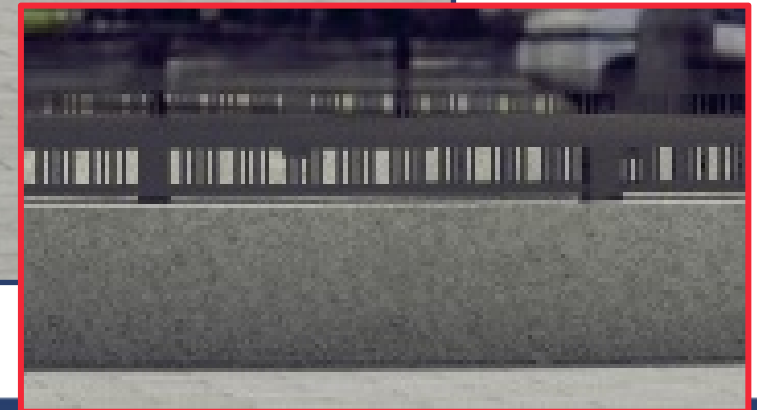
BR27C Thick Mounted Bridge Railing (LR442).
